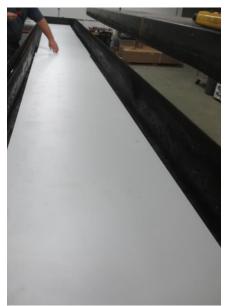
Unexposed Surface of the Test Specimen (Pre-test)
